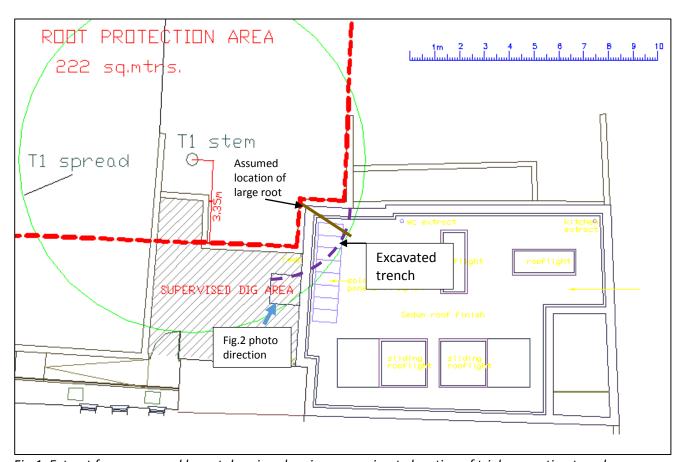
Extract from proposed layout drawing showing approximate location of trial excavation trench
